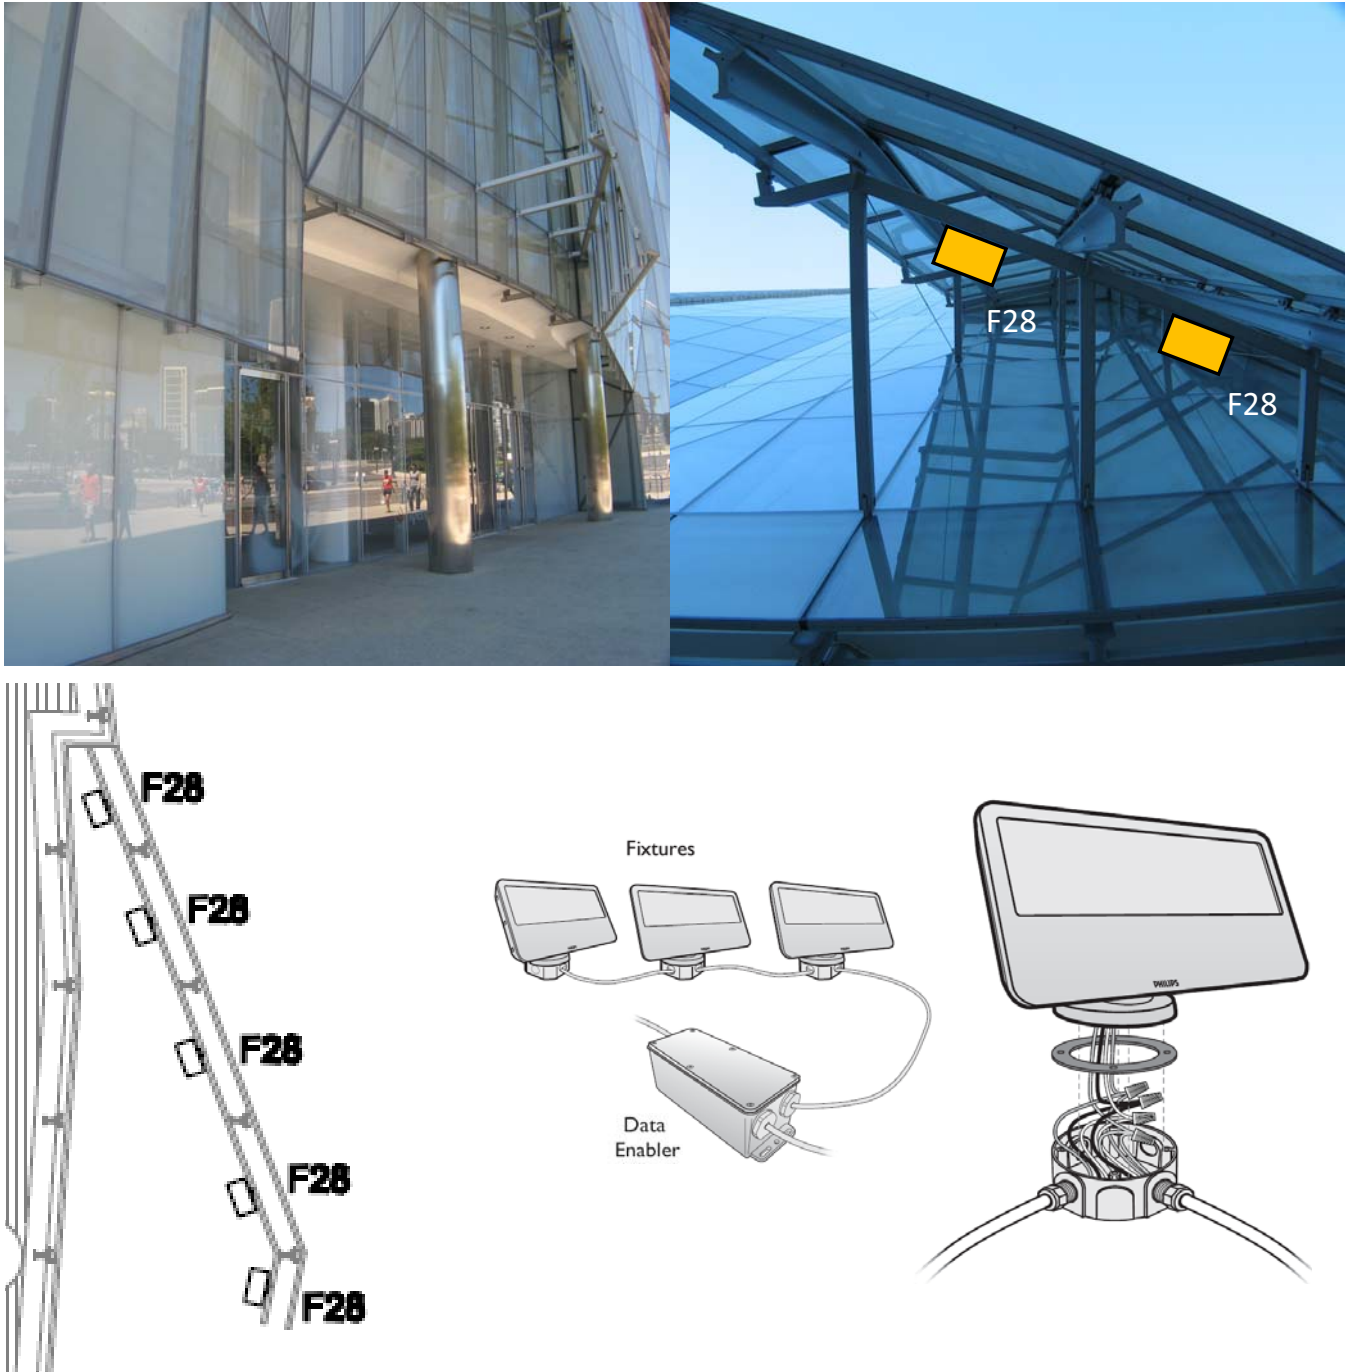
FIXTURE TYPE F28 MOUNTING LOCATION AND INSTALLTION DETAIL (COLOR KINETICS)
